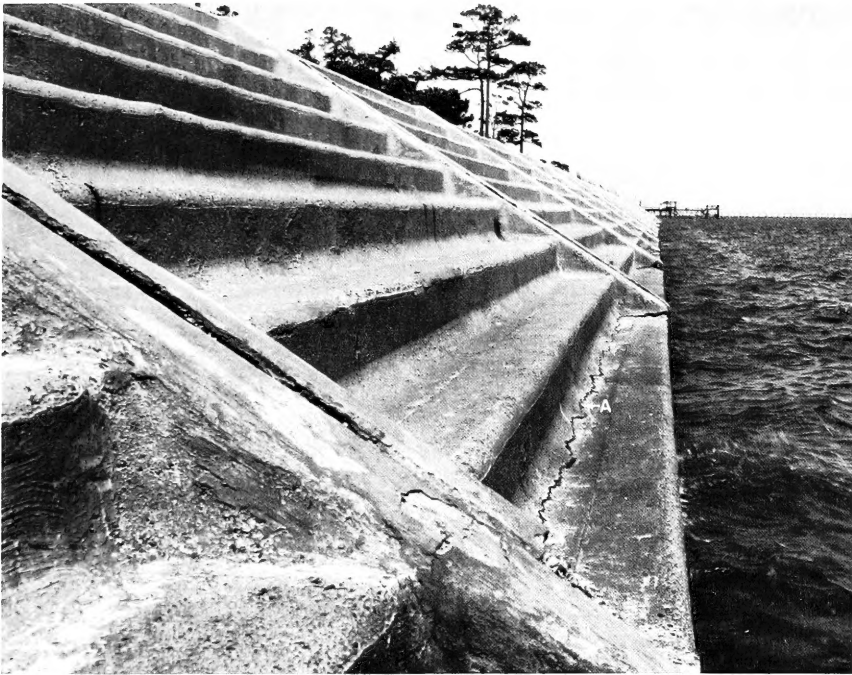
TYPICAL CONDITION OF SEAWALL PRIOR TO REPAIRS
